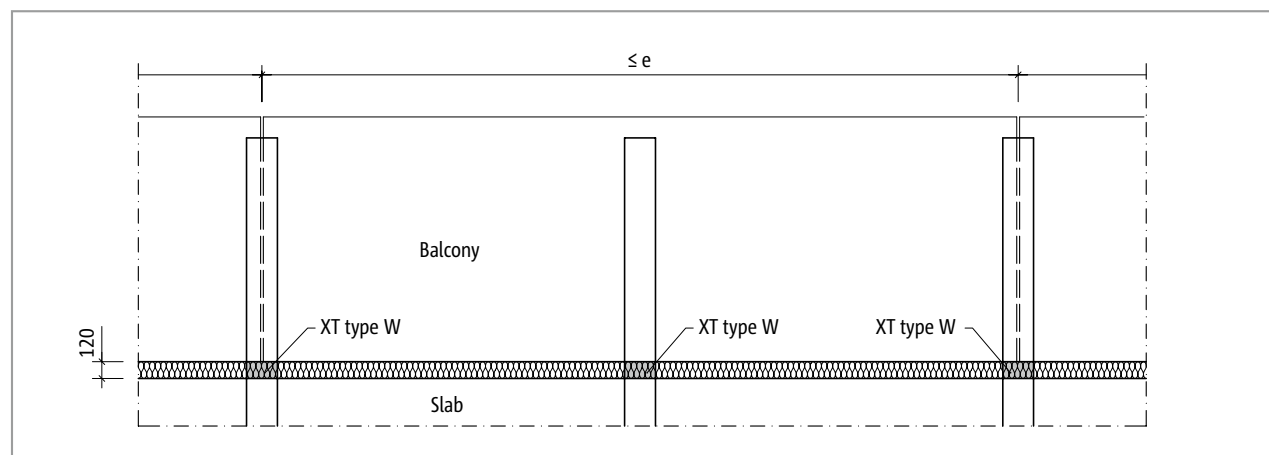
Schöck Isokorb® XT type W: Expansion joint arrangement
